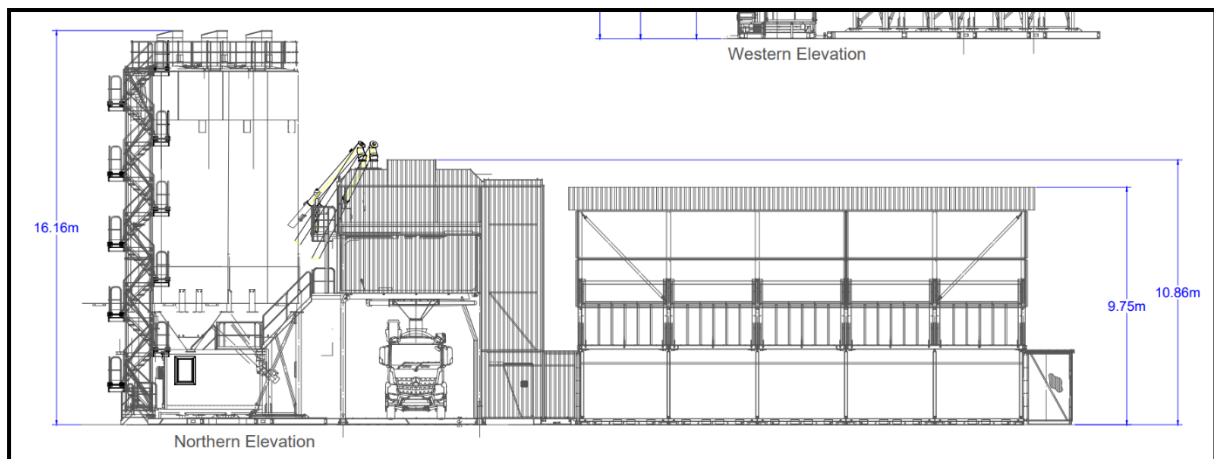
Ready Mix Concrete Plan Elevation Plan submitted with the planning application
